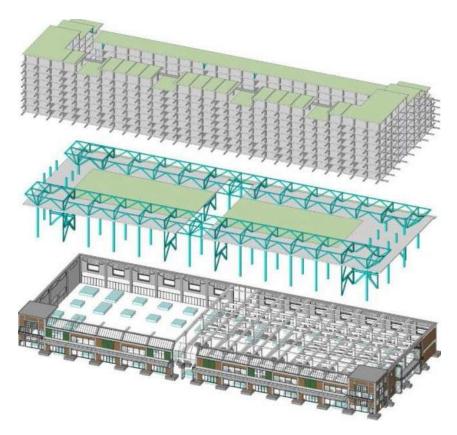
Fenix I redevelopment structural design (Courtesy: ABT)
